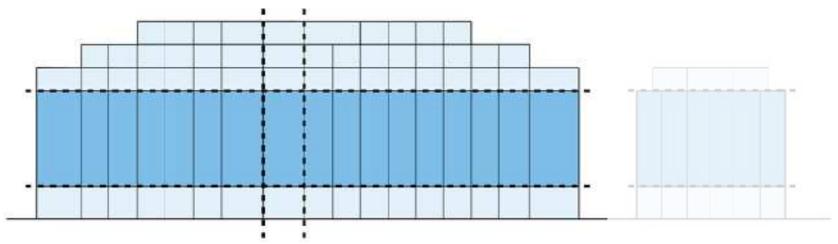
Plot C1A north elevation - frontage proportion and subdivision
